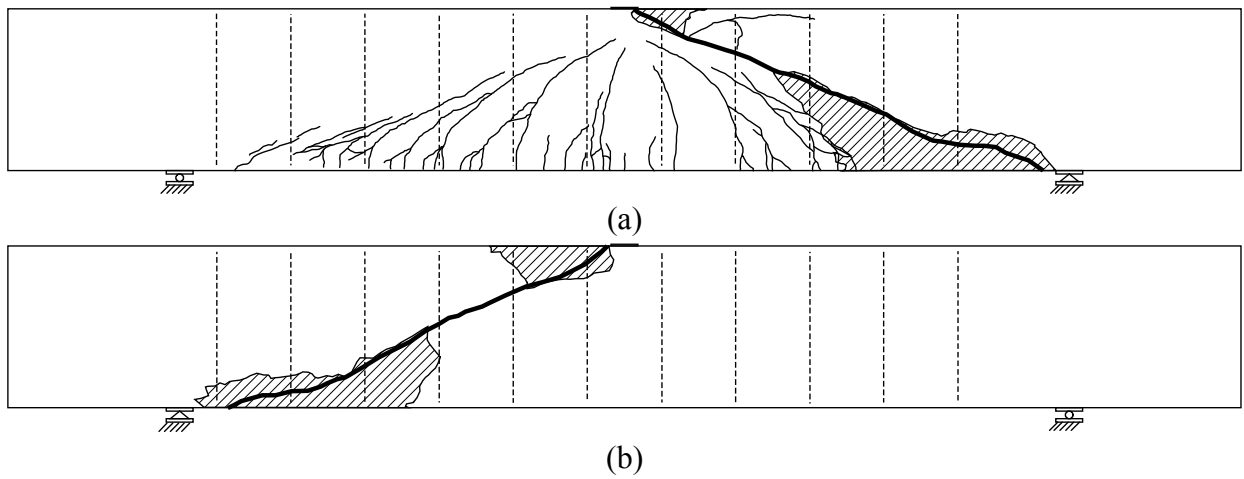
Observed damage in specimen P2S8, (a) front side, (b) back side
